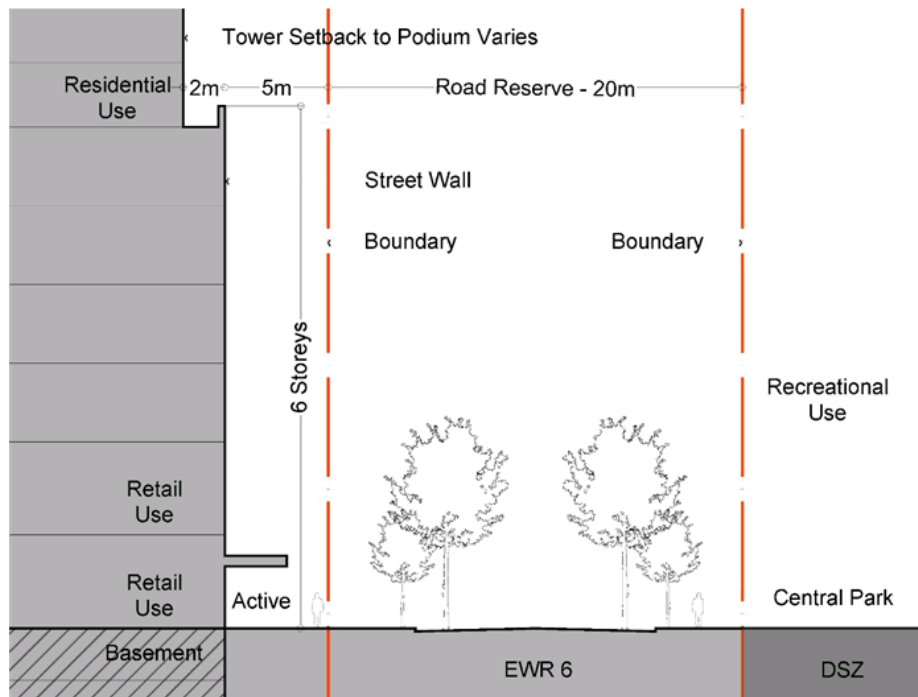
Street Wall Height in Town Centre
